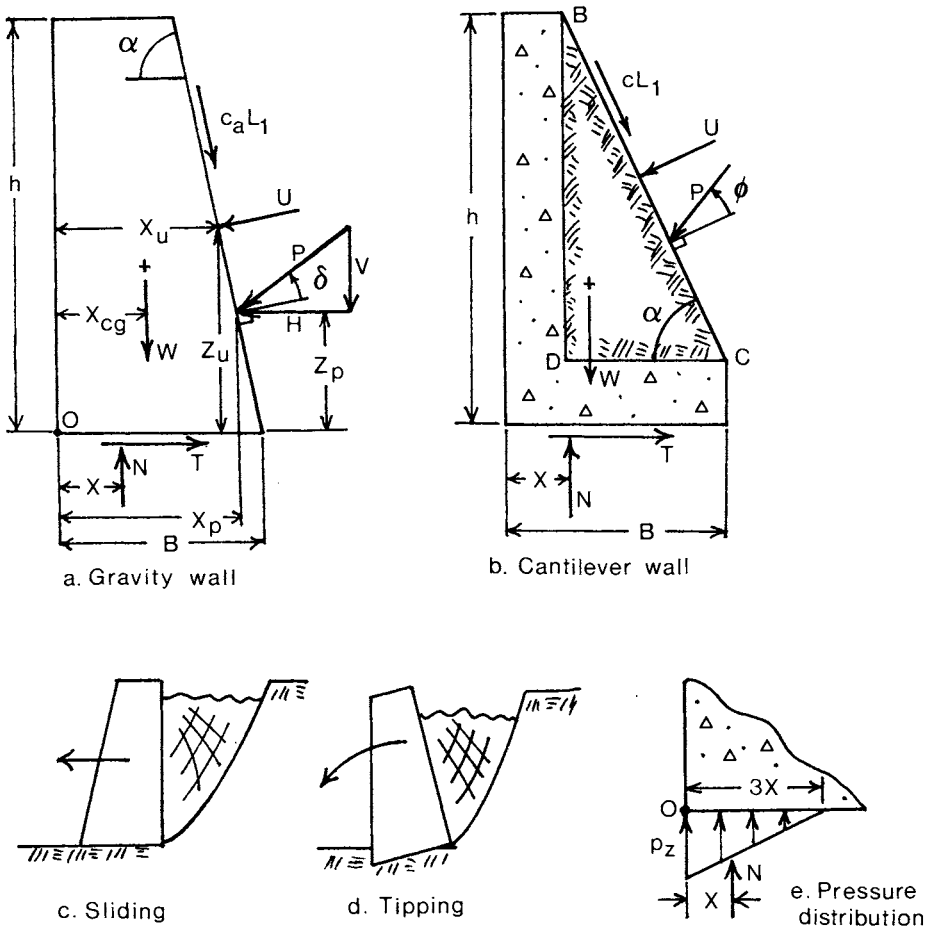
Forces on (a) a gravity retaining wall and (b) a cantilever wall, plus for your added entertainment (c) the sliding wall failure condition, (d) wall tipping and (e) the pressure distribution under the walls.
